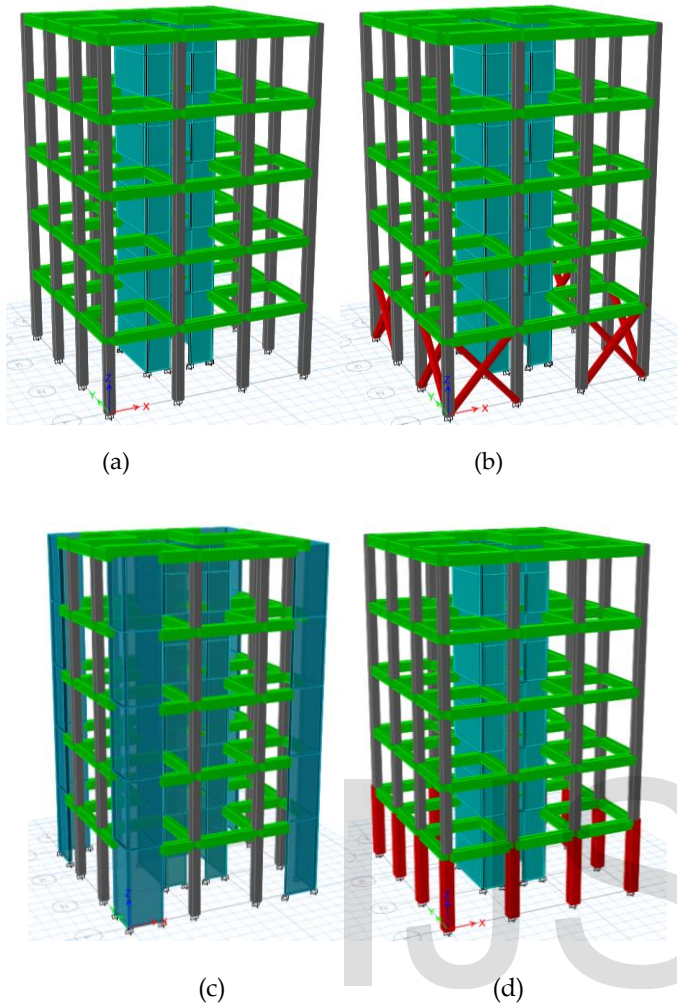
(a) building with softstorey (b) building with cross bracing (c) building with shearwall (d) building with thicker columns
